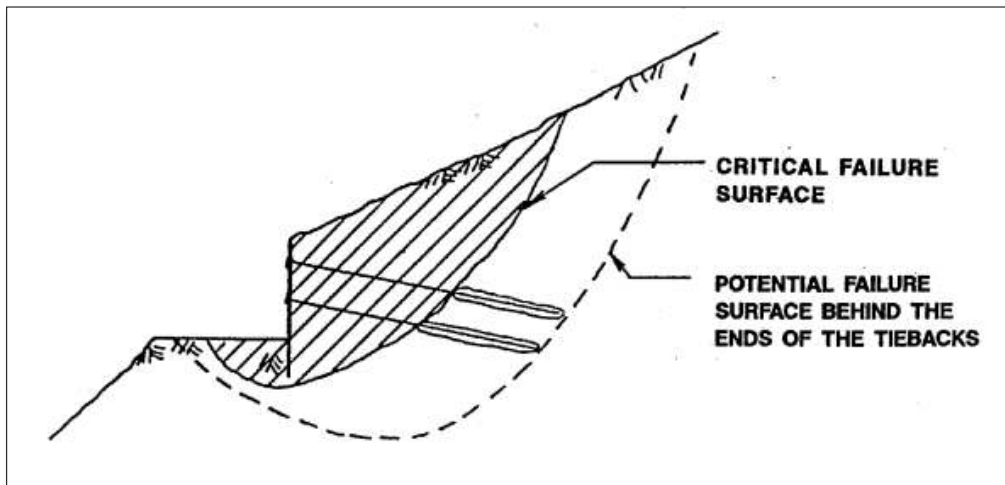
Tieback Anchors to Stabilize a Slide Mass [50]
